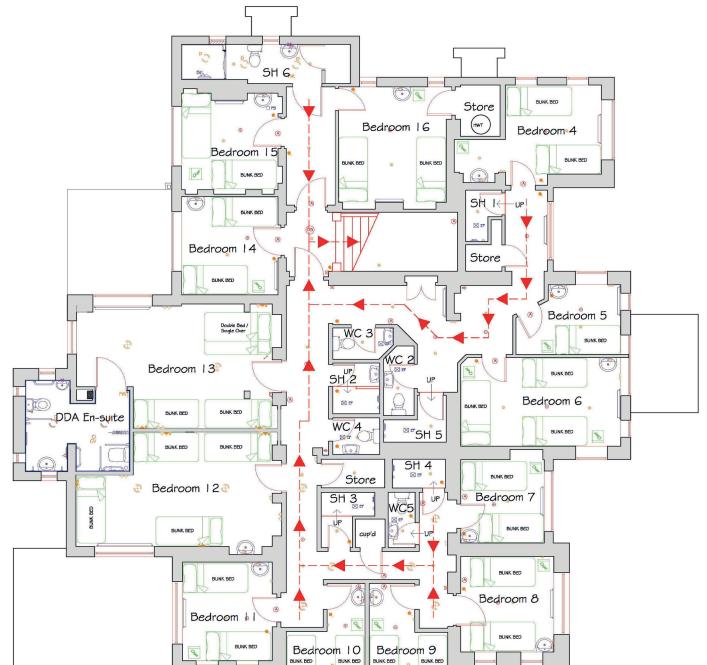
YHA Windermere - First Floor Fire Plan (YHA Windermere, 2009)
